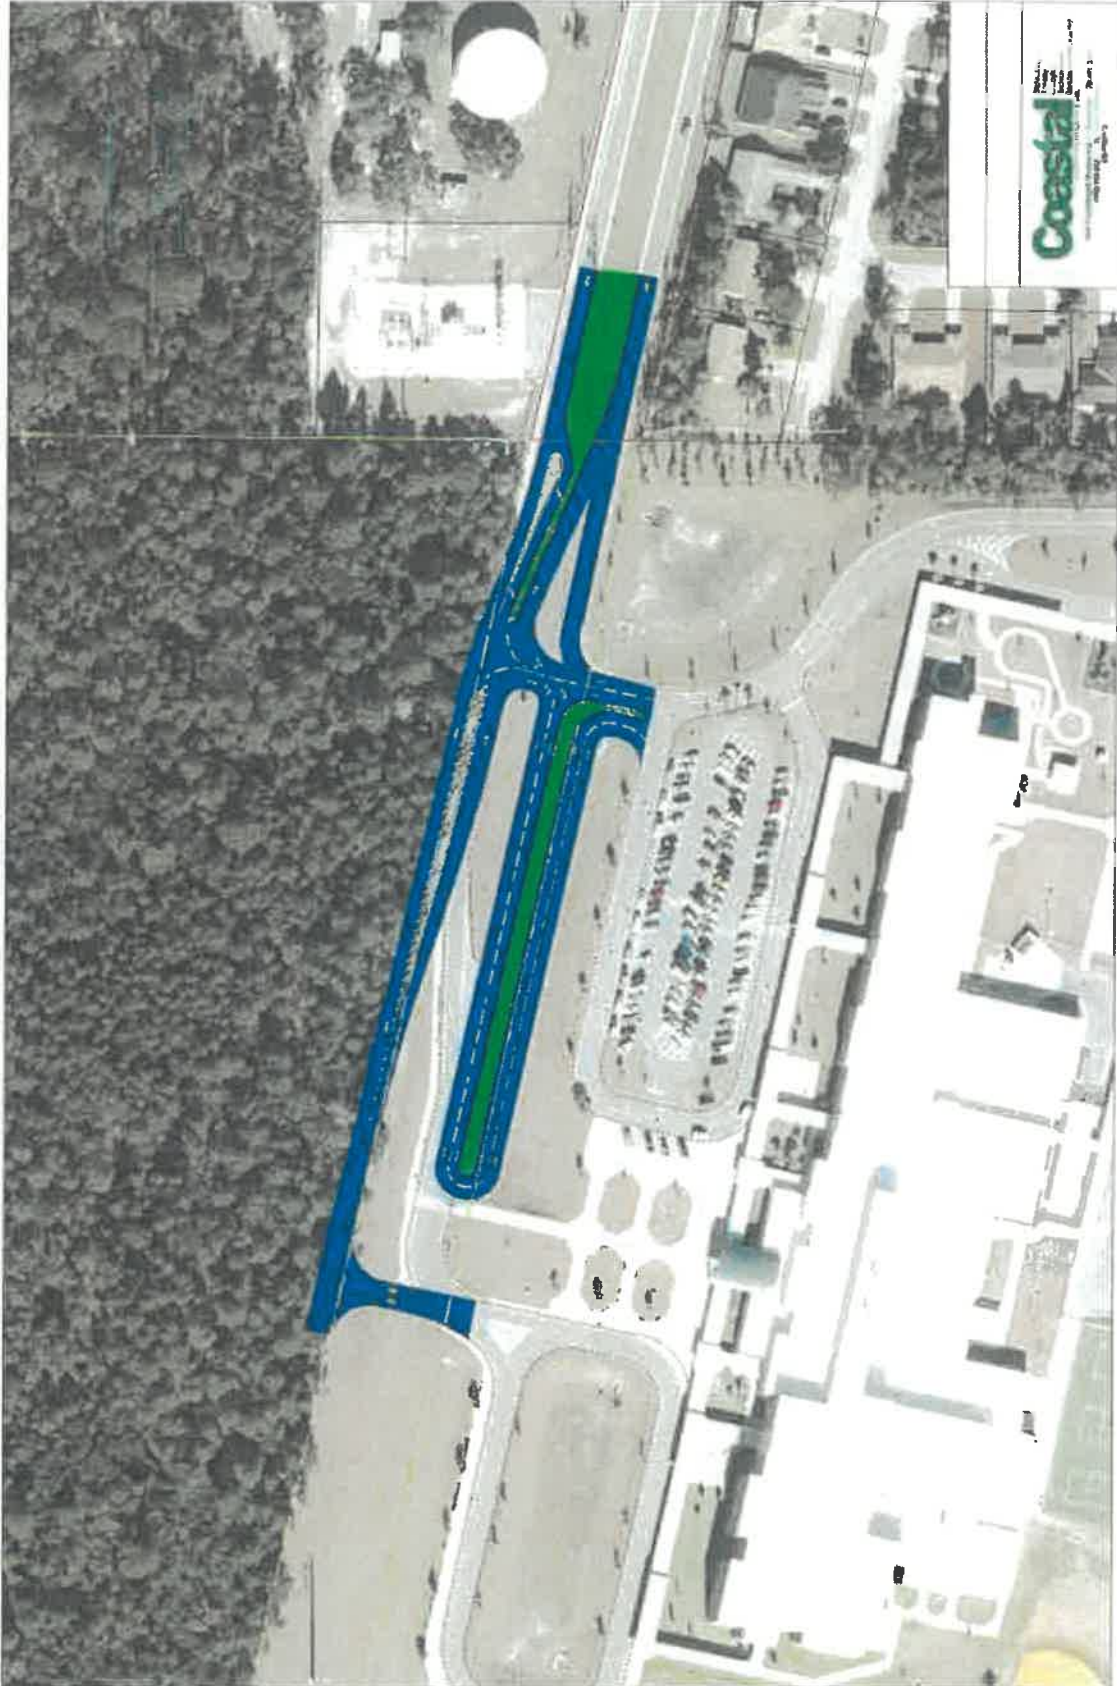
EXHIBIT D - OFFSITE ROADWAY IMPROVEMENT PLAN
